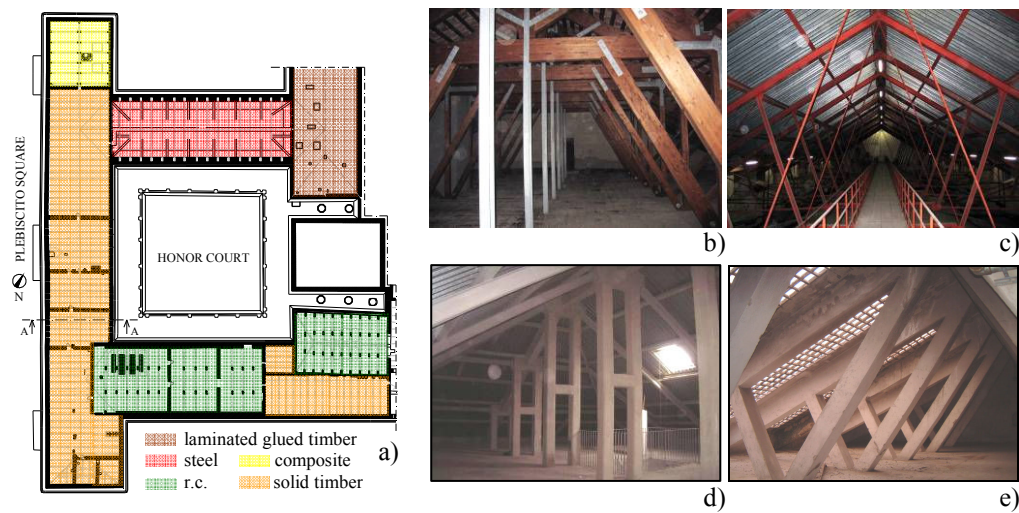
The Royal Palace of Naples – Roofing structures: a) Laminated glued timber; b) Steel; c) Composite; d) R.c.
